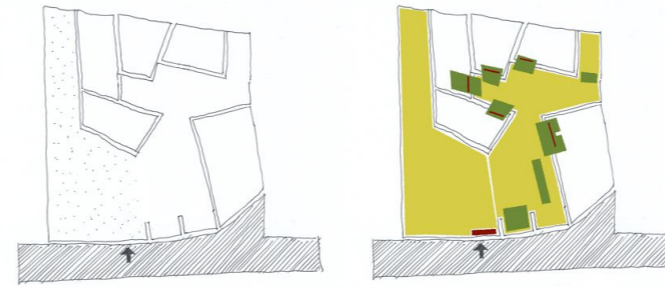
T-house by Sou Fujimoto in Maebashi, Gunma (Japan), 2008: territorial structure and access configuration (based on original floor plan ground level)
